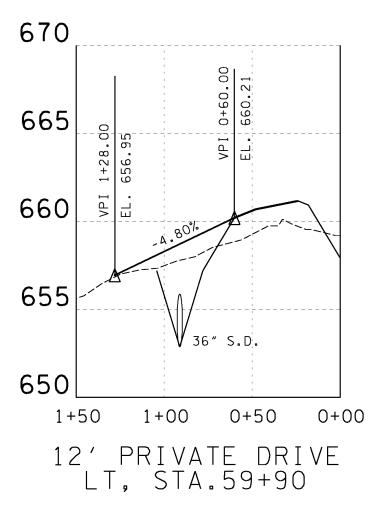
A-9. Portion of Private Drive and Field Ramp Profile Sheet
